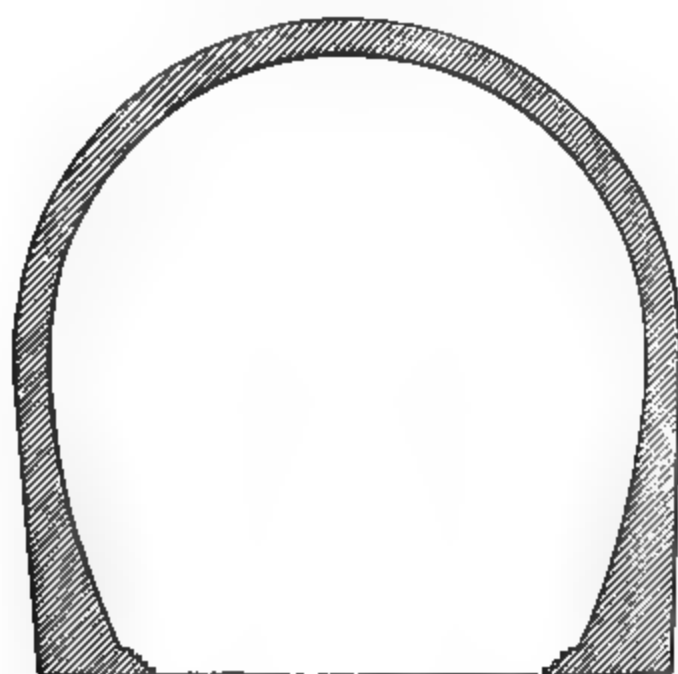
Railway Tunnel, Watford, London and North Western Railway.
